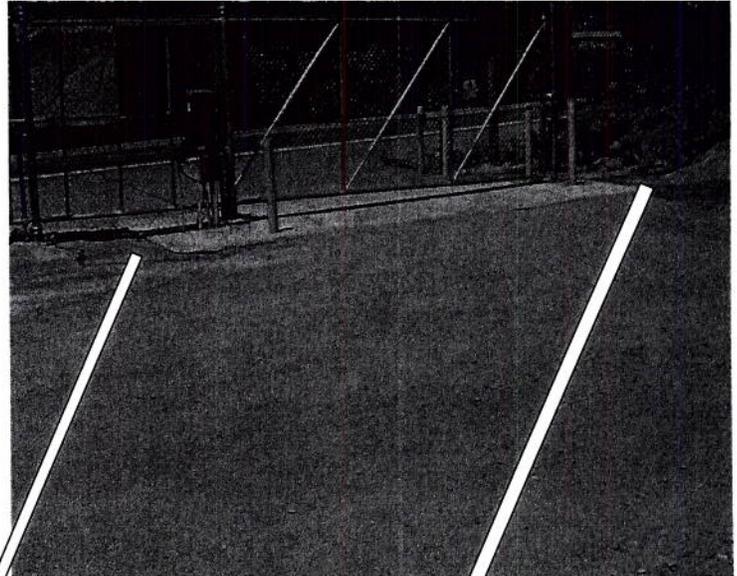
Failure to implement BMPs to manage stormwater runoff from the drivable surfaces at the entrance and along the west side of the construction site.
